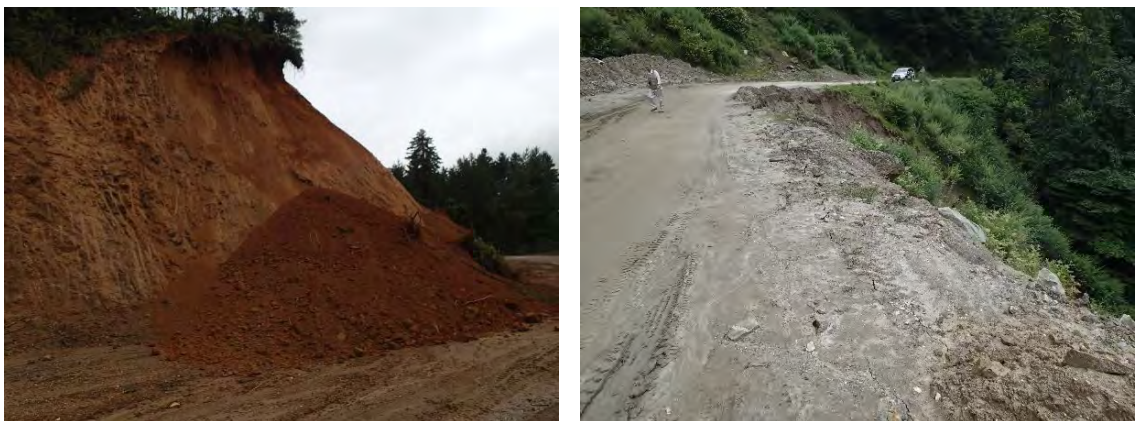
Photo of Typical Slope Disasters in Bhutan, Cut Slope Failure (left), Subsidence with Crack on Earth Fill Work Section (right) (Source: JET)
